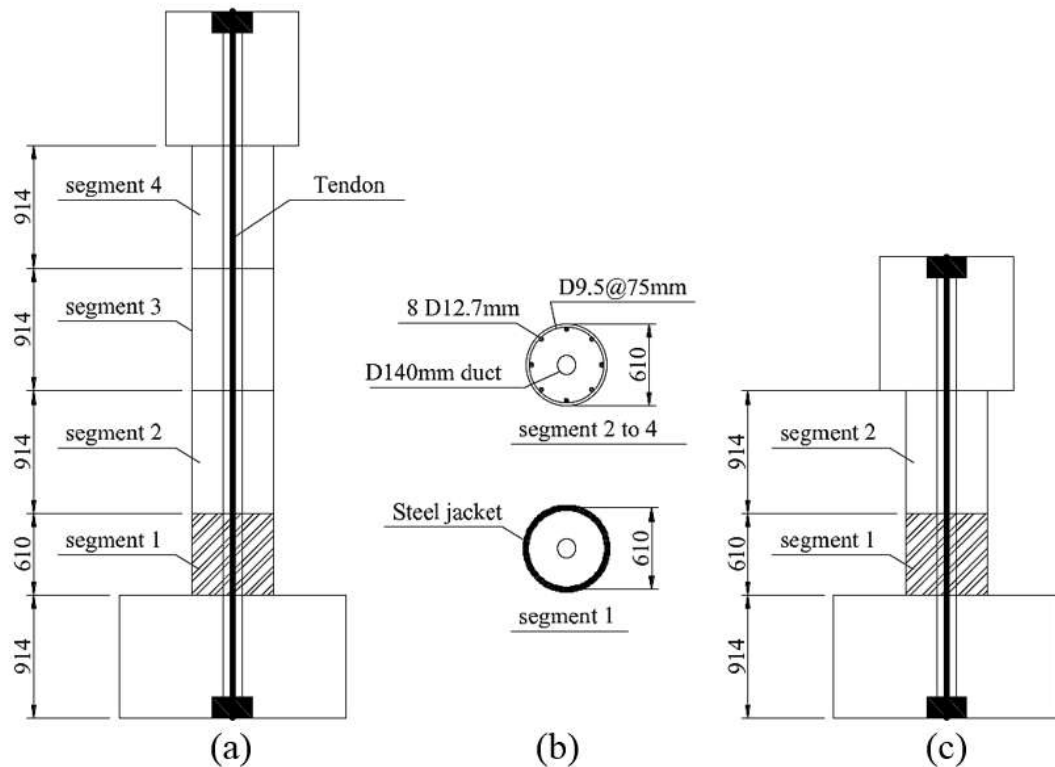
Design details of the specimens: (a) JH1; (b) Cross section; (c) JH3
